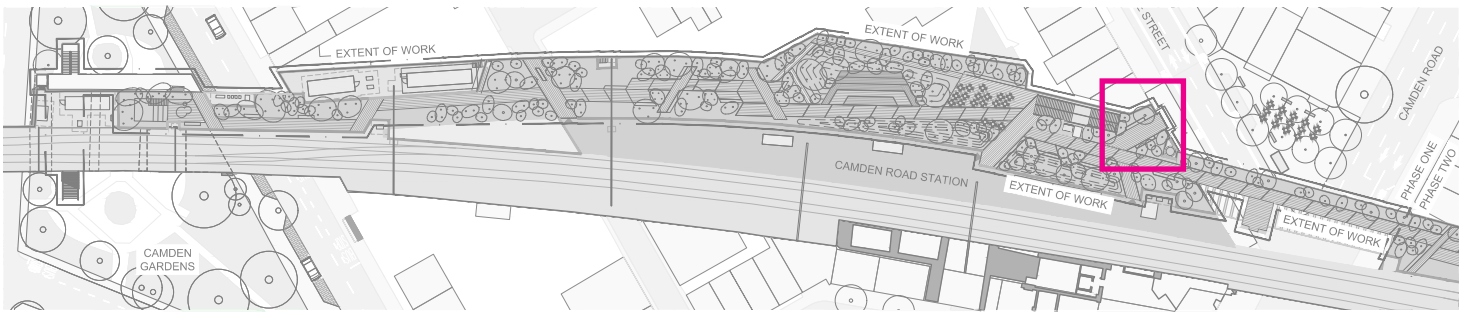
ROYAL COLLEGE ST. WASTE BIN LOCATION PLAN
